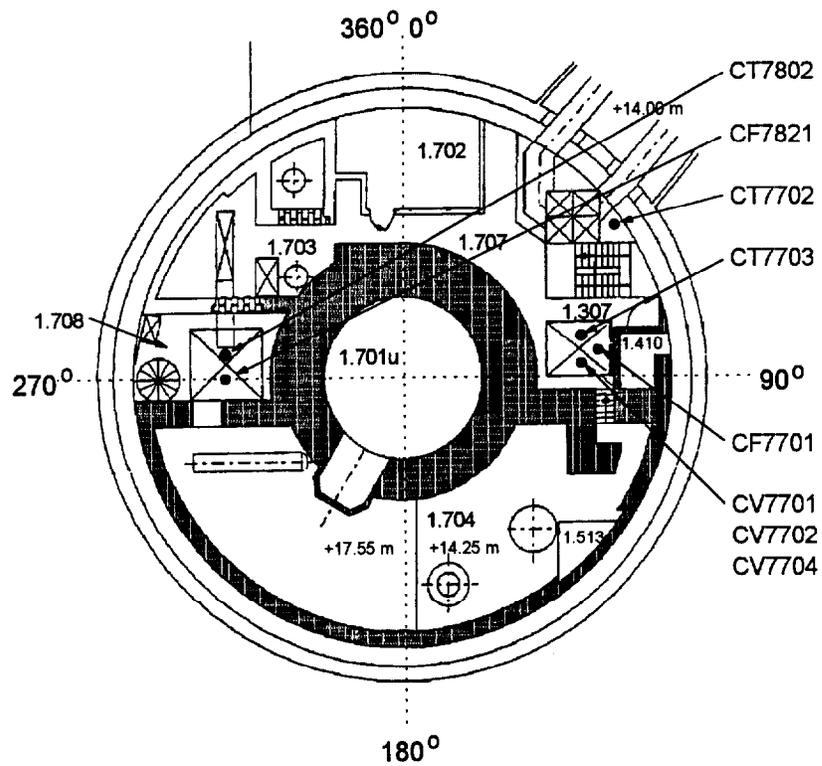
Level 1.700 at the +17.0 m Elevation for T51.2
